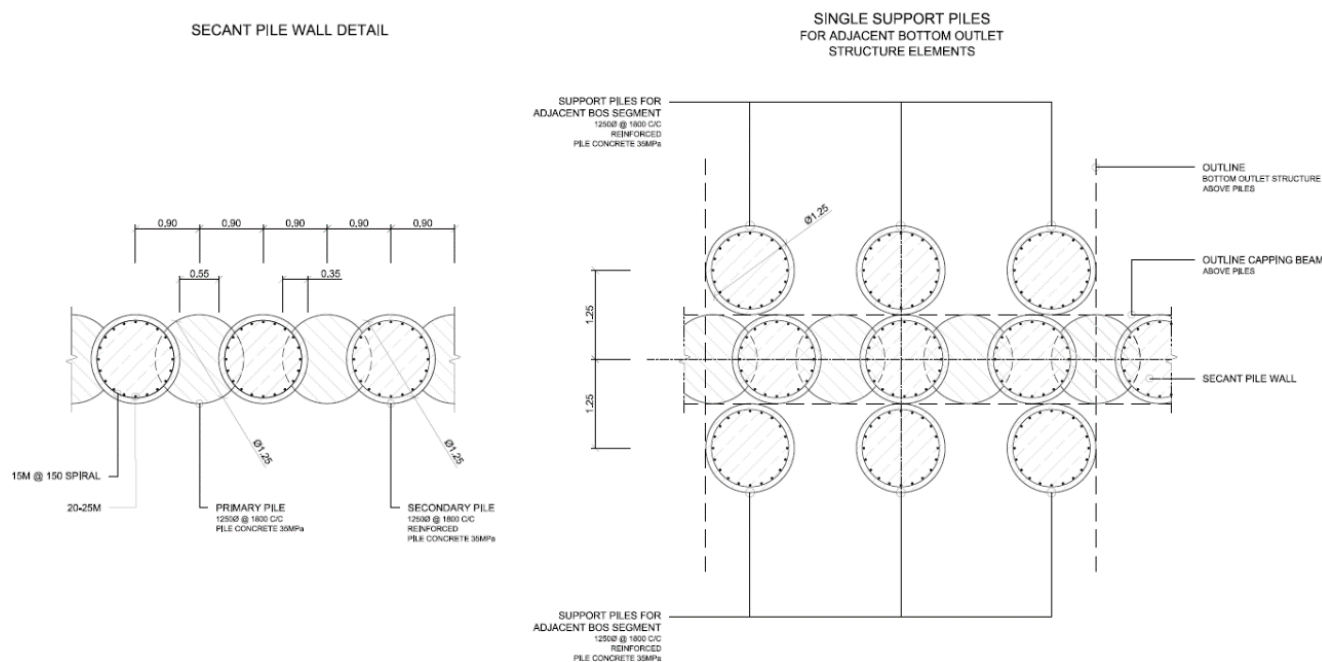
Construction scheme of the secant pile wall and adjacent support piles for the BOS (see Drawing LTMM CC-DFG-404 R00)
